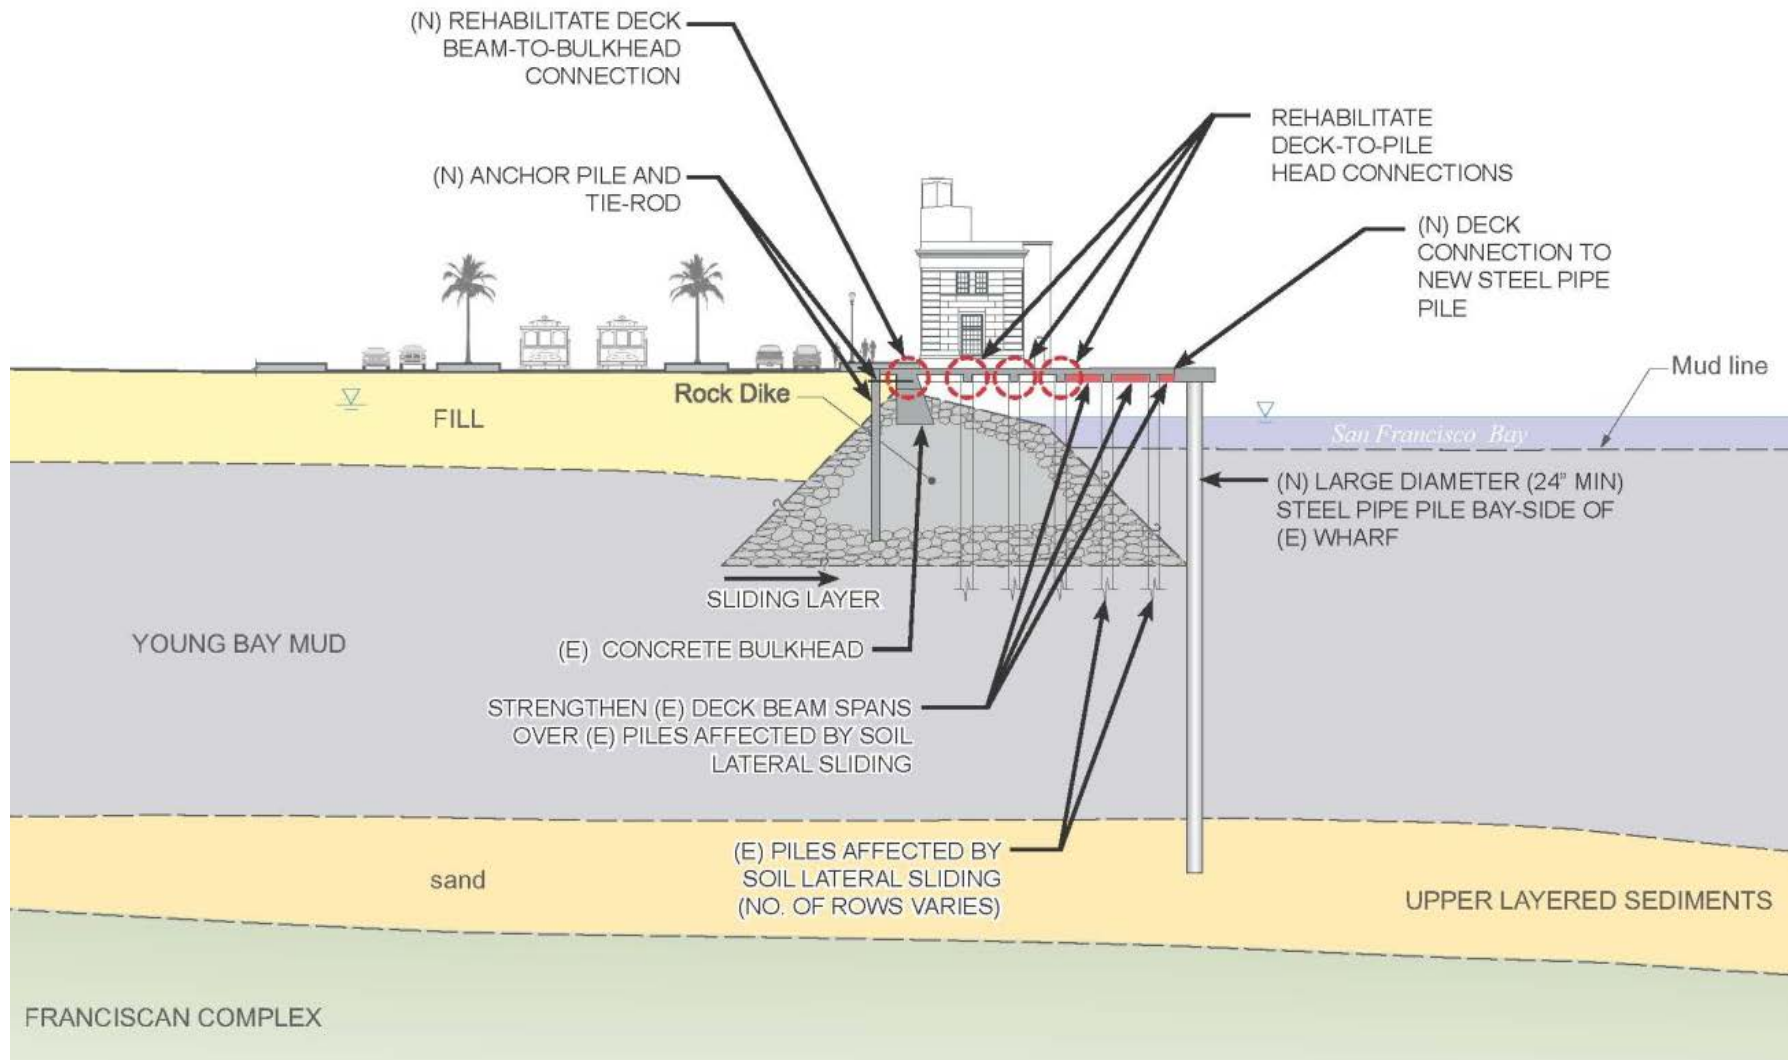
Bulkhead Wall Retrofit - Summary of Retrofits
